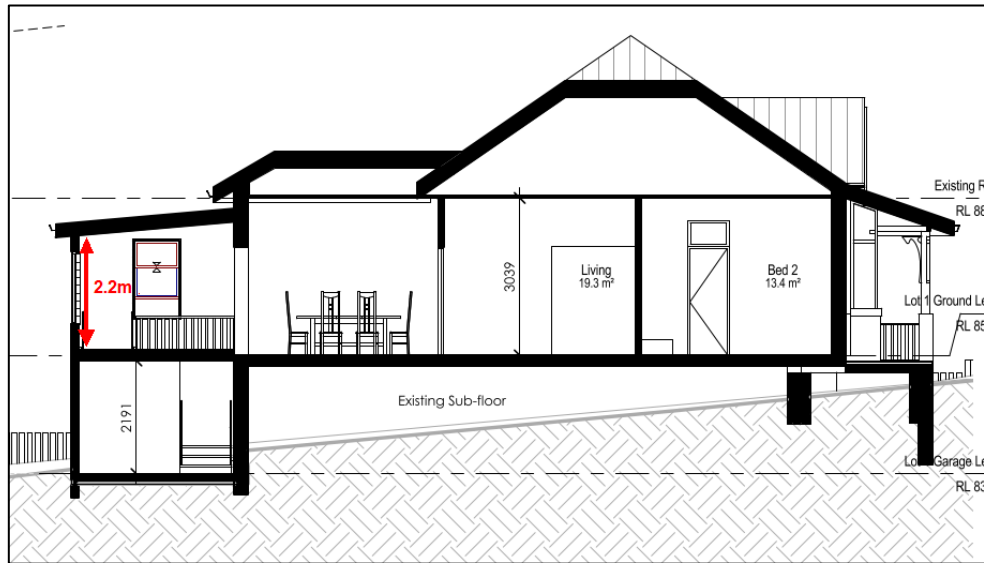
Section plan of existing dwelling showing non compliant floor to ceiling height of 2.20 metres
